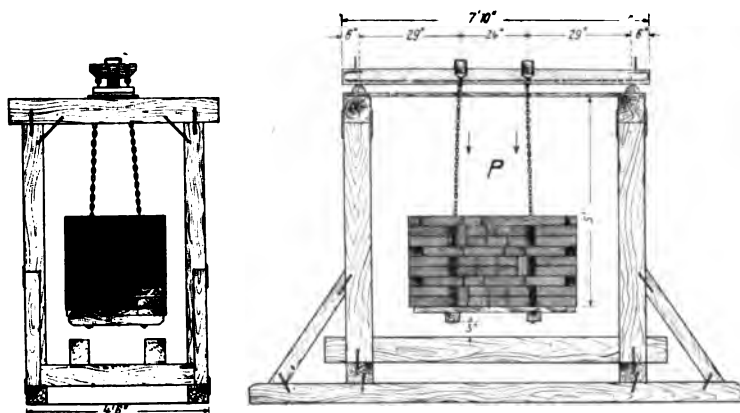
ARRANGEMENT OF TESTING APPARATUS.
